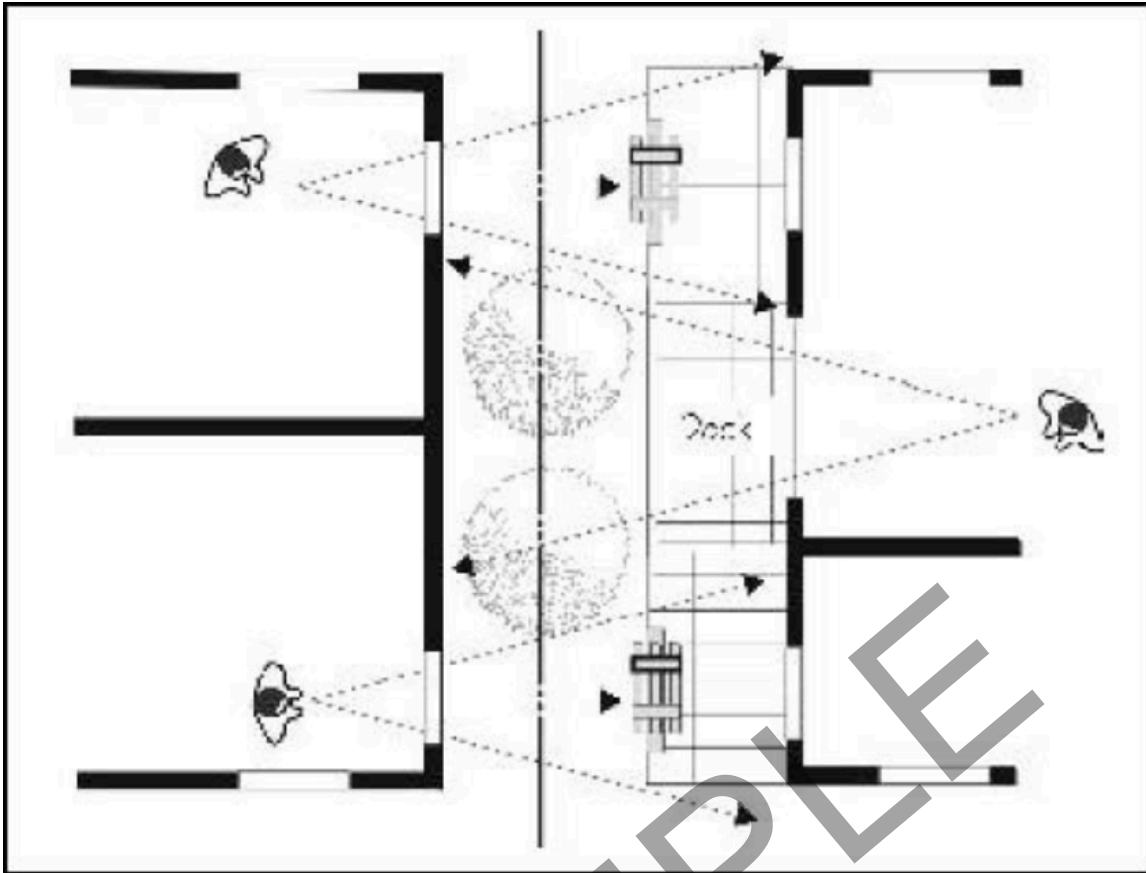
Offsetting window locations will help prevent views into adjacent houses.
